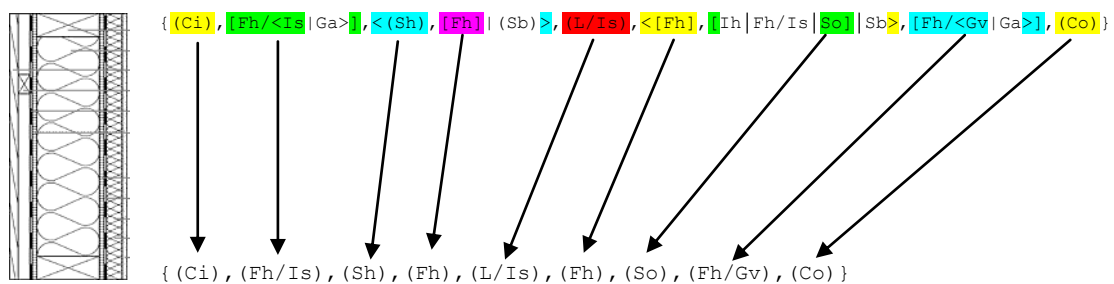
Outside wall construction awrhhhi01a (Source: www.dataholz.com)
